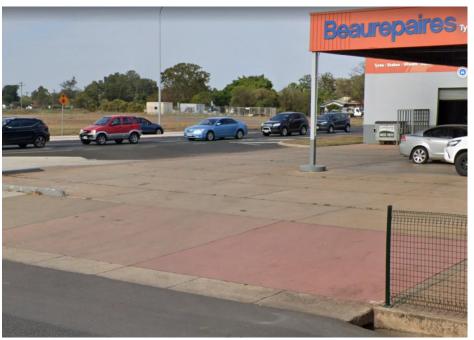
Culvert under the "Beaurepaires" Crossover (Google Street View)
